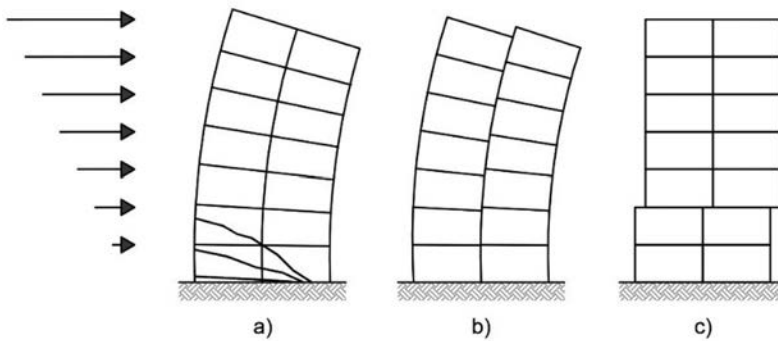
Seismic failure mechanisms for shear walls in LPE buildings: a) monolithic behaviour; b) weak vertical joints cause vertical slip, and c) weak horizontal joints cause horizontal slip (based on UNIDO 1983).
